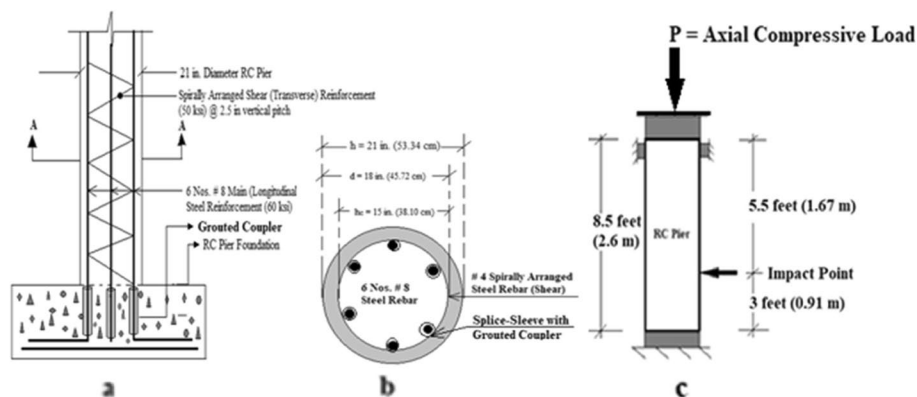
Schematic diagram of coupler arrangement in a pier-foundation, b section A-A and c boundary conditions and loading type
